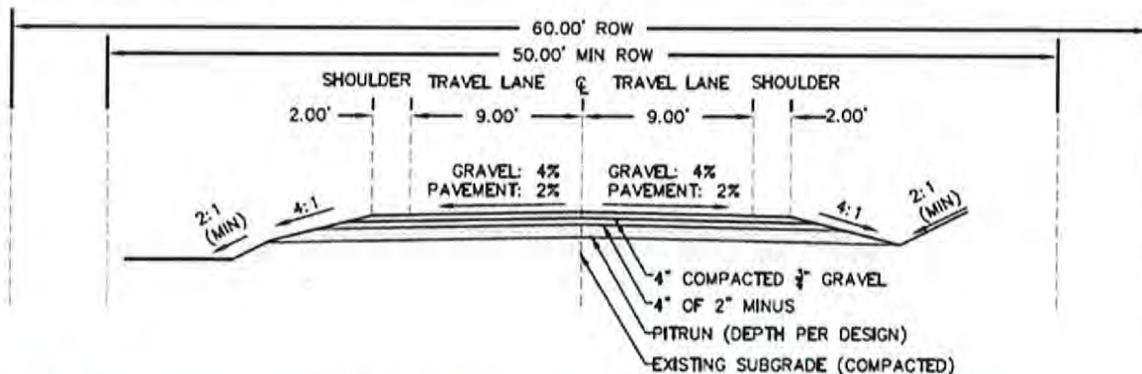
Highway and Street Guidelines for Design and Construction in Teton County, Idaho-4/11/2013 (Page 18 of 46)
